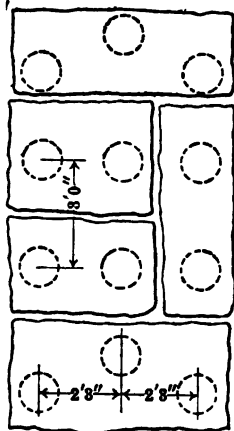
Stone Capping for Three Rows of Wooden Piles
